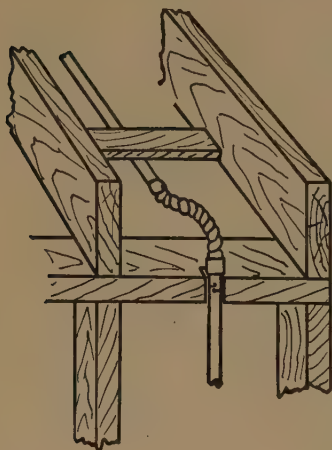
A sketch showing an application of combined rigid and flexible conduit.
